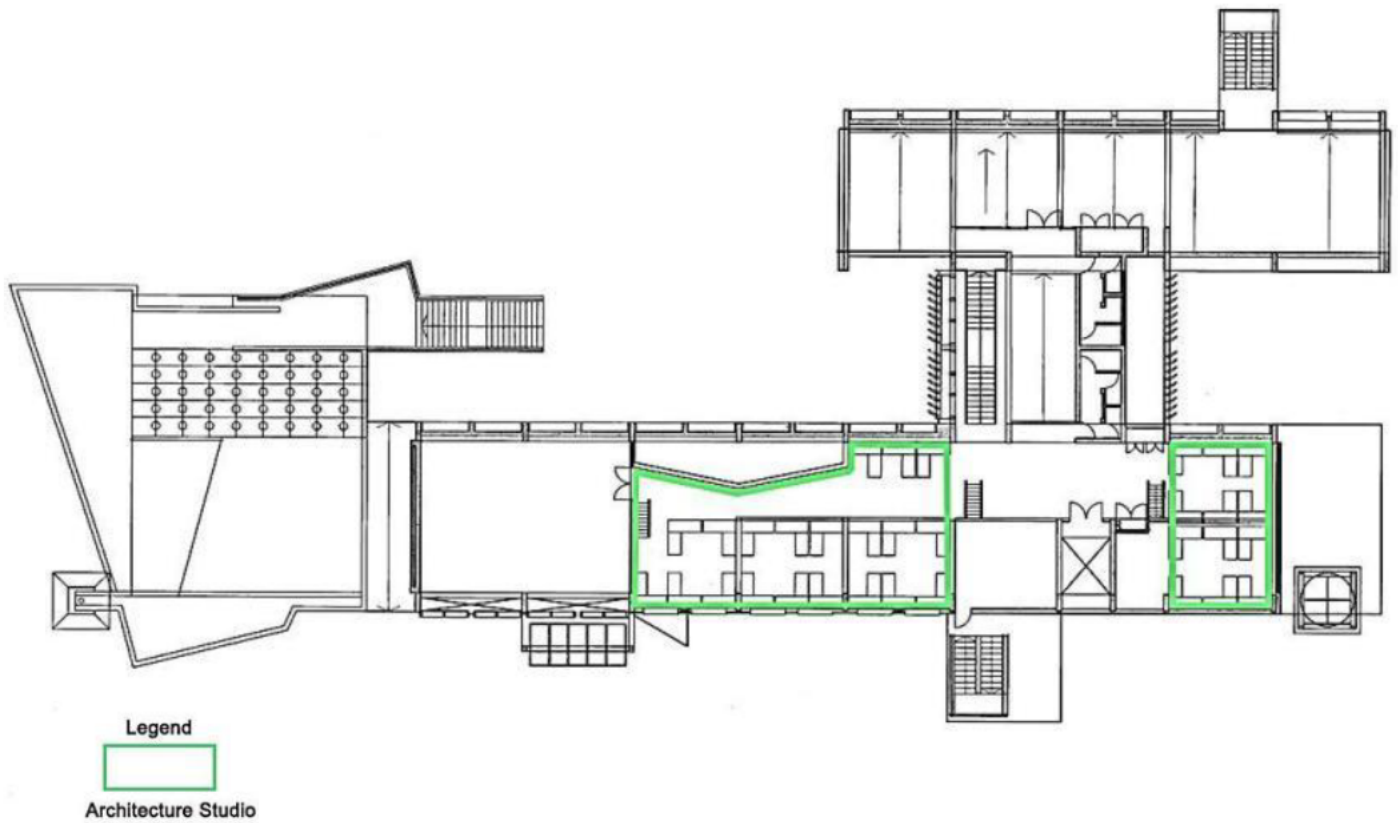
First Floor - TUT Department of Architecture , Scale: 1:250 (Luckan 2016)
